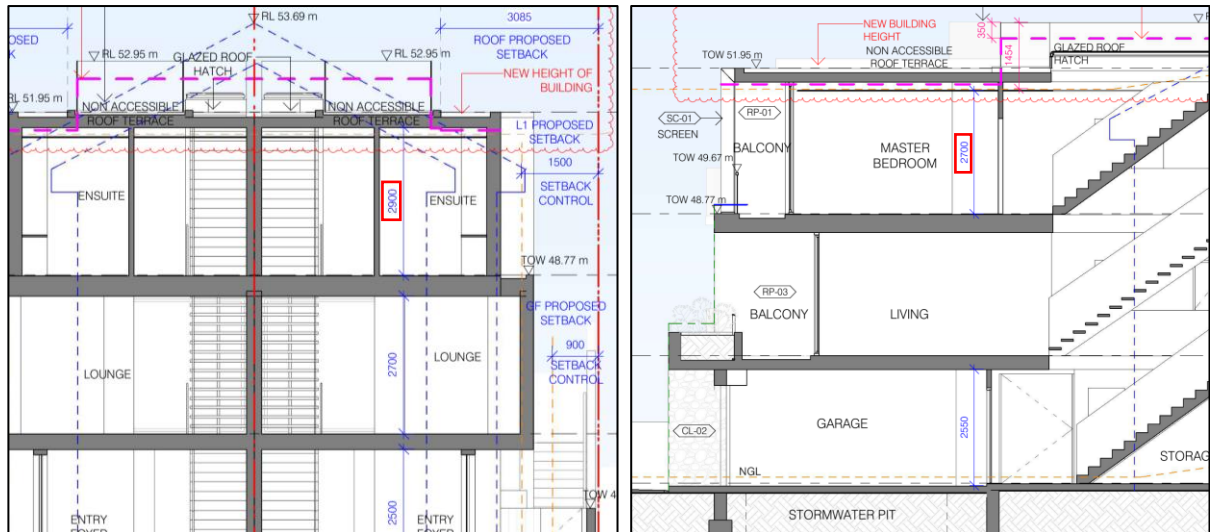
Section A – Part A and Section B through the building showing different floor to ceiling heights of the approved development, as proposed to be modified
